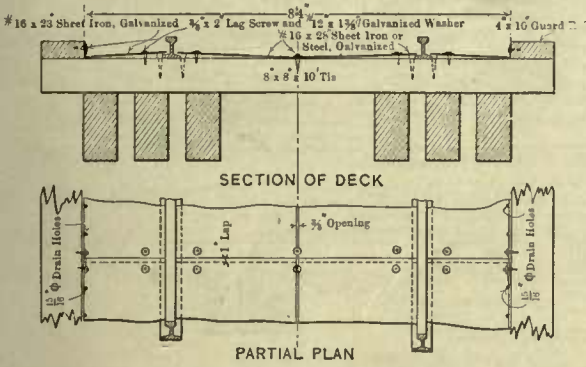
FIRE-PROOFING FOR TIMBER TRESTLES.
